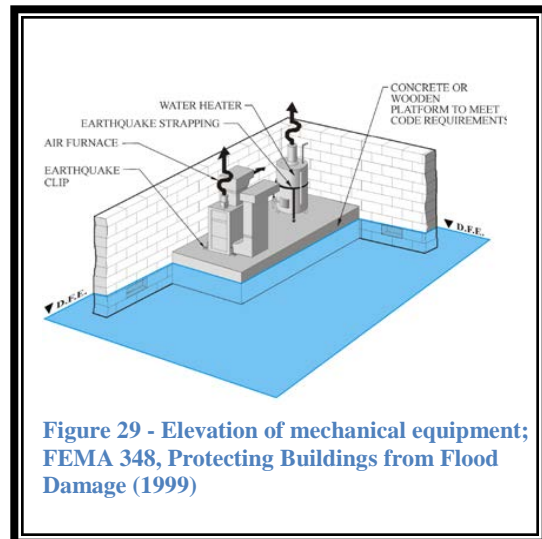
Elevation of mechanical equipment; FEMA 348, Protecting Buildings from Flood Damage (1999)
